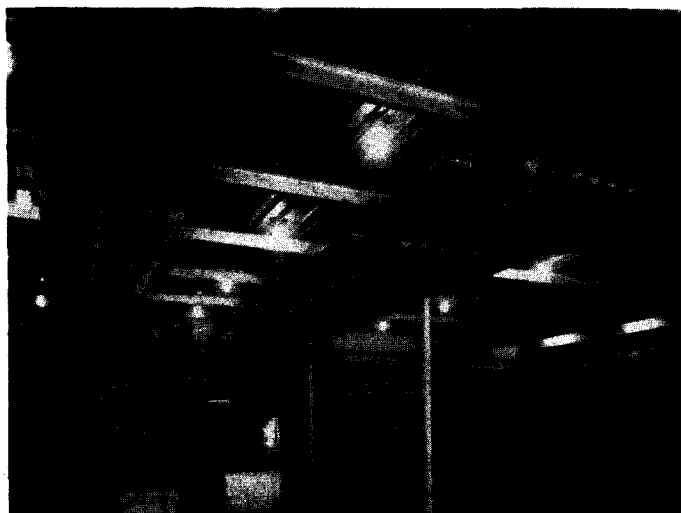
Overhead installation of natural convection evaporator. Evaporator has cast aluminum fins. (Courtesy Detroit Ice Machine Company.)
